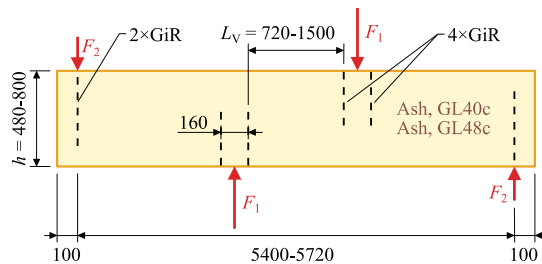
Asymmetric 4-point bending tests on European ash GLT: geometry of test specimens and test configuration (dimensions in mm, drawing not to scale).
